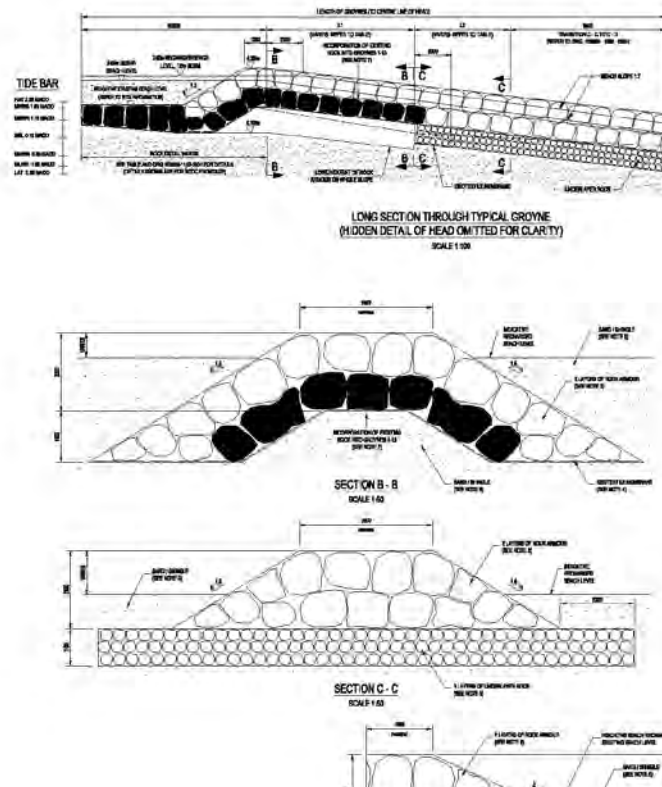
Extract from detailed design drawings – sections through rock groynes
